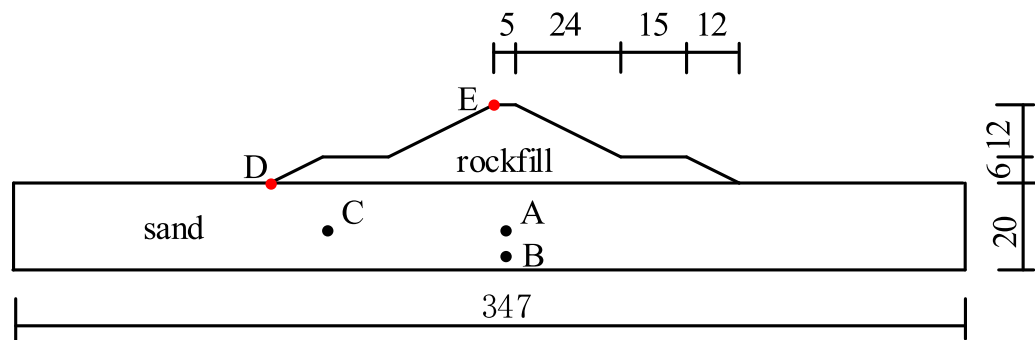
Sketch for a rockfill breakwater built on sand foundation (units: m).
